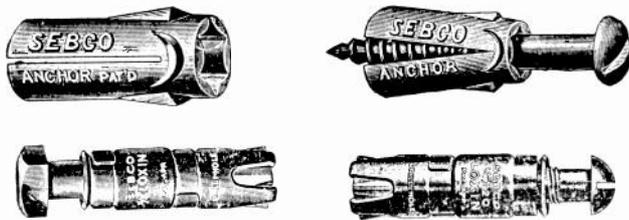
Several types of expansion bolts and shells used for fastening conduit strips to holes and masonry.
